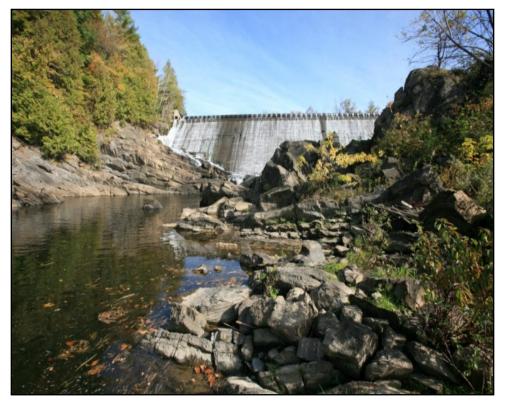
Huntington Falls Dam and Bypassed Reach
